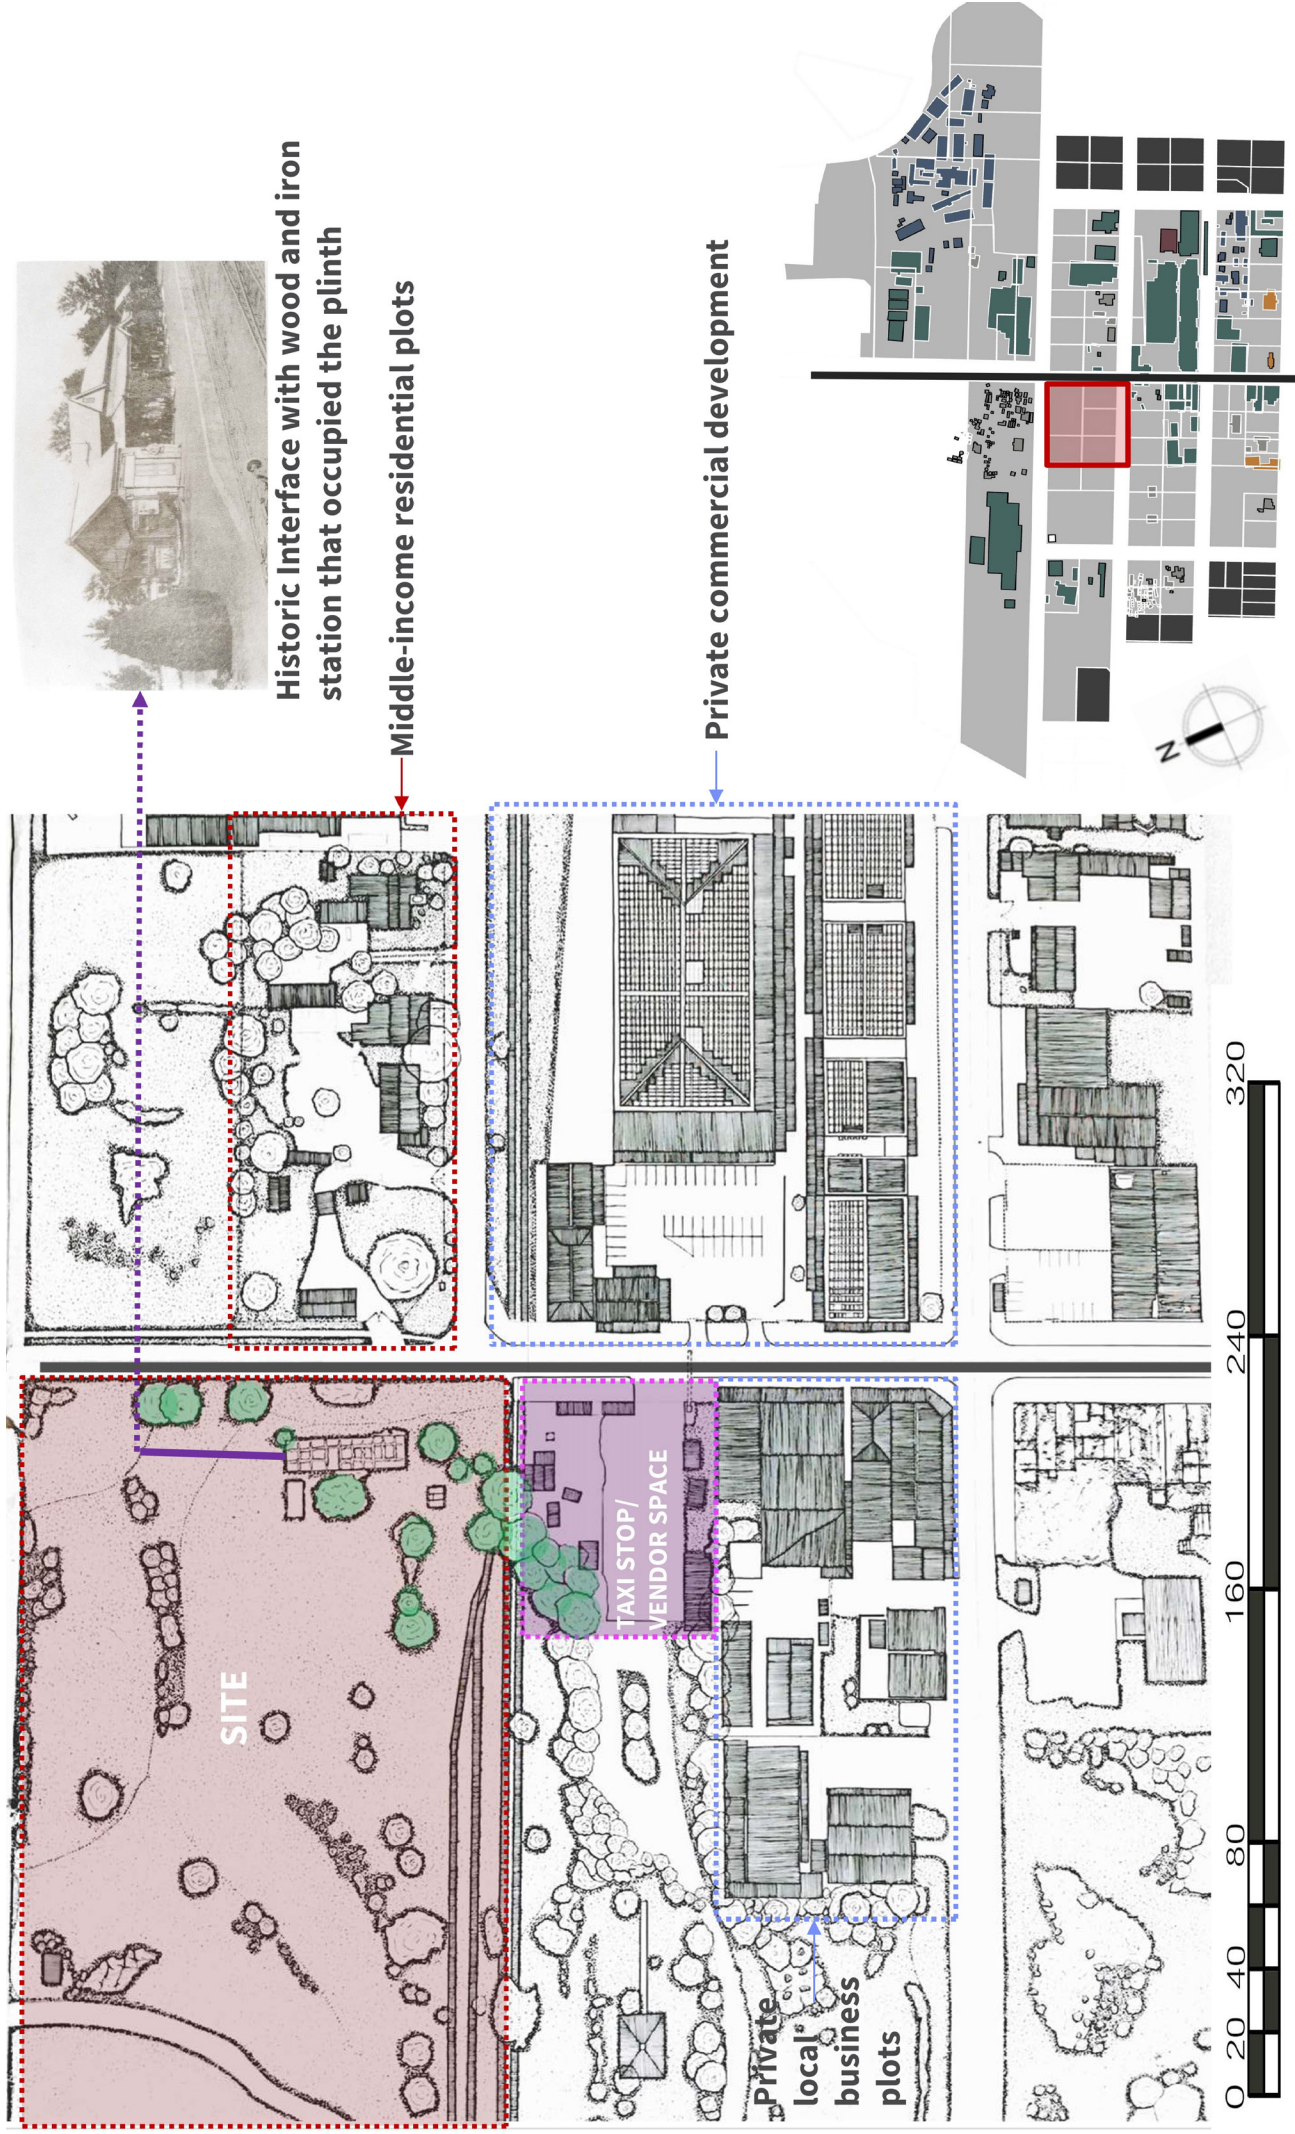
Plan drawing of my site and the immediate surrounding context (Authors Own)
